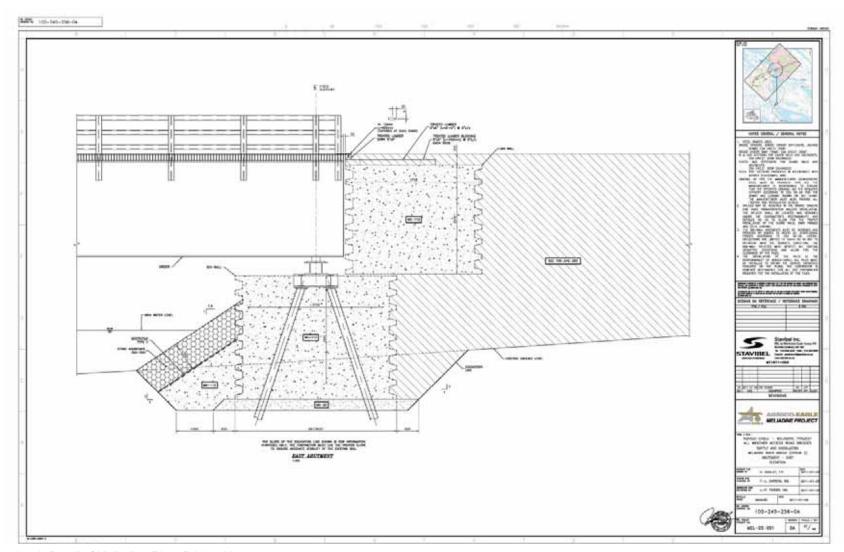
Detail of Meliadine River Bridge Abutment
